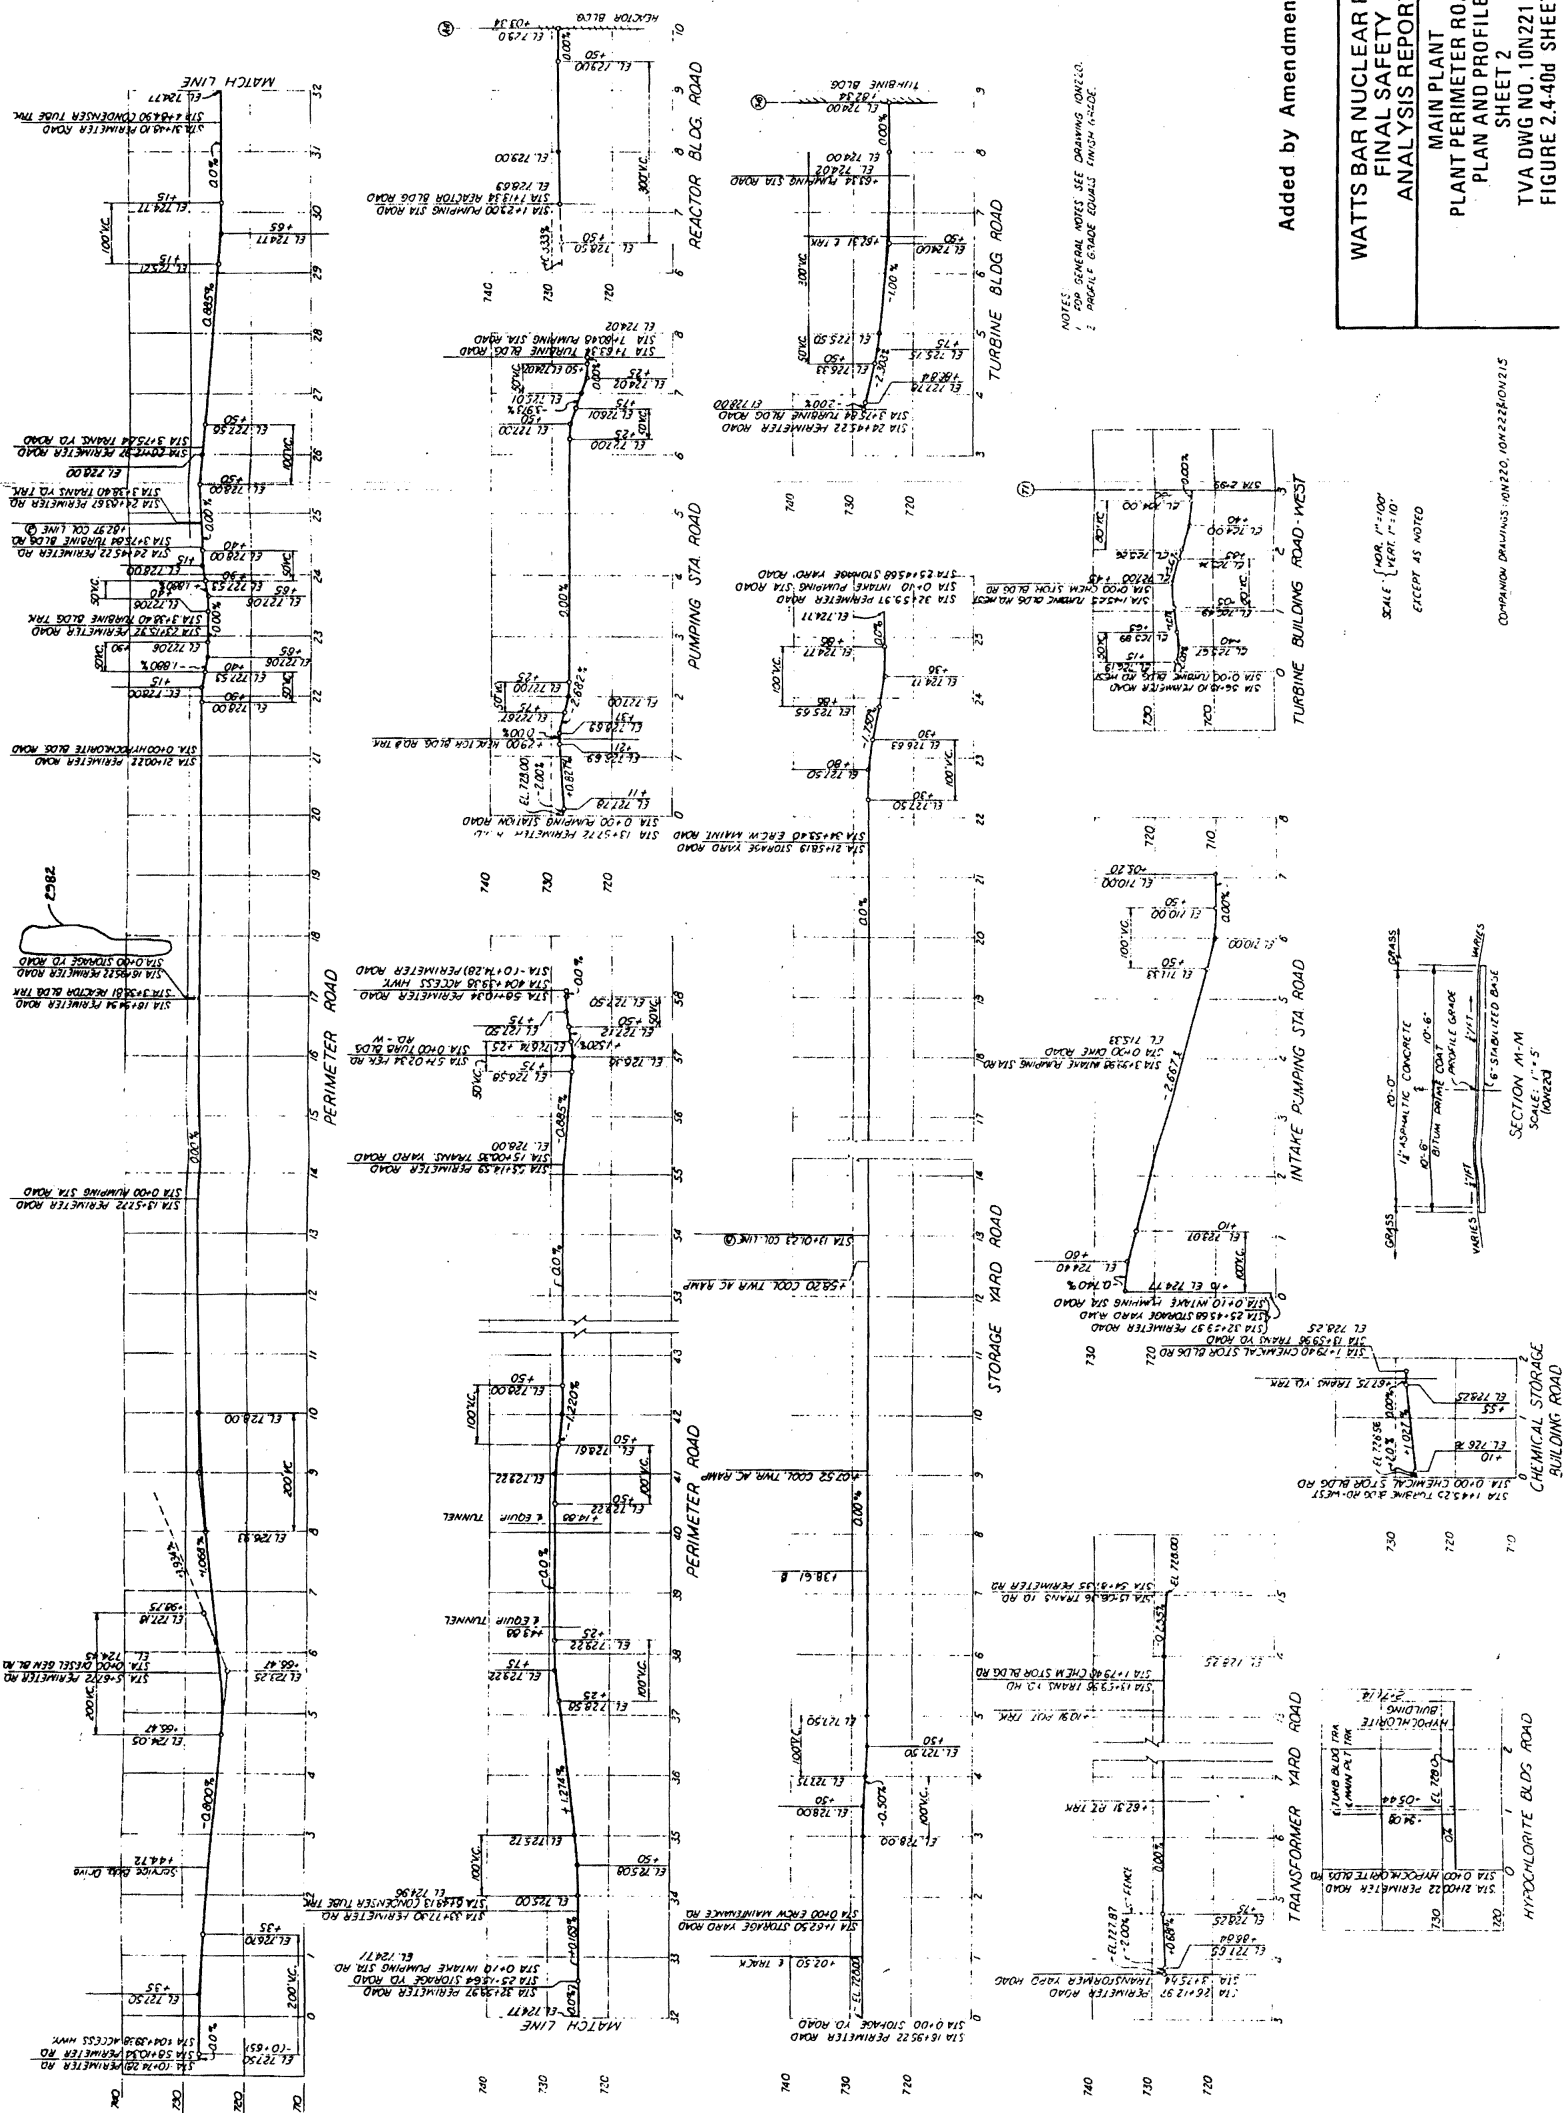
Main Plant Perimeter Roads Plan and Profile - Sheet 2
